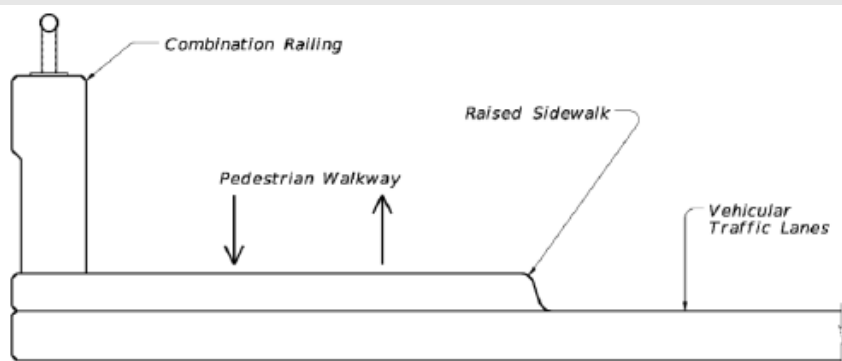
Bridge railing for vehicular and non-vehicular traffic -- low speed
